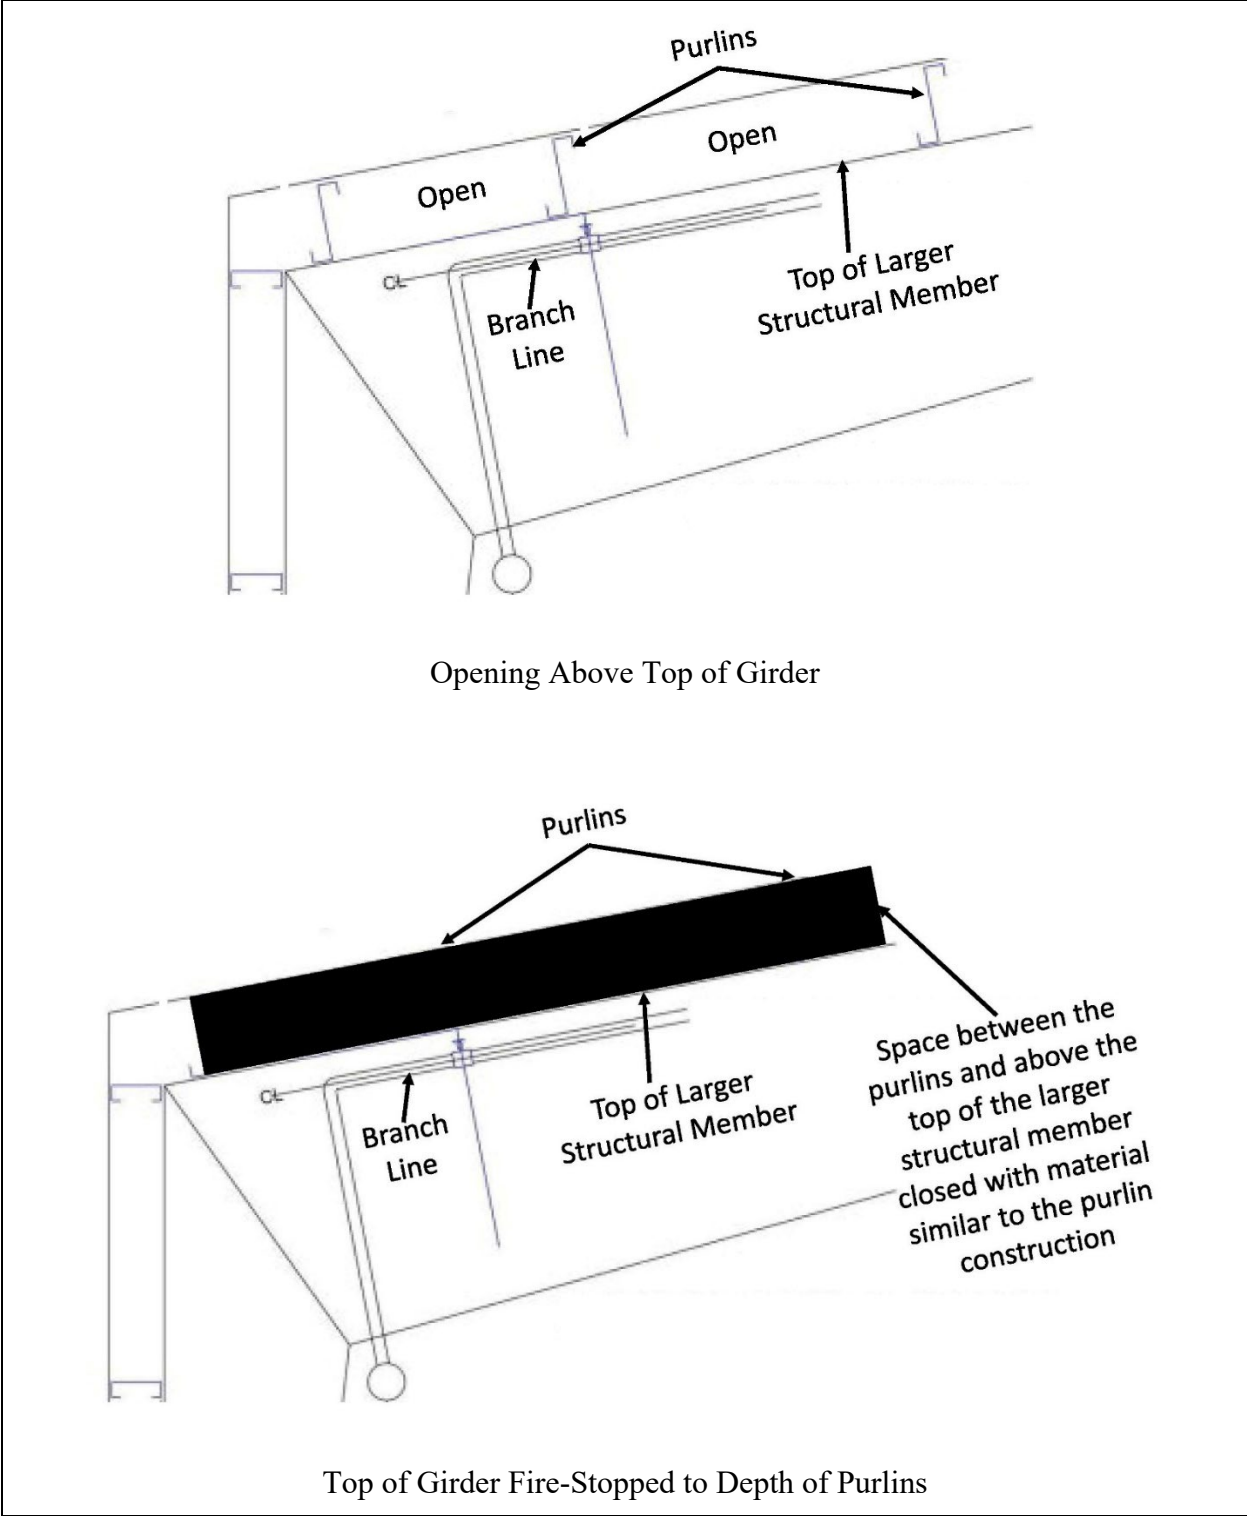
Example of Fire-Stopping at Intersection of Purlins and Girders
